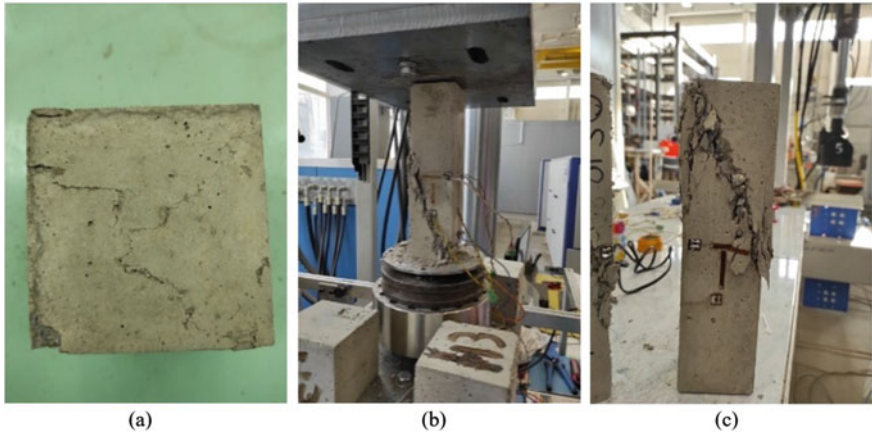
Close view of the test specimens: cubes (a); prism in the testing machine (b); close view of the prism after testing (c)
